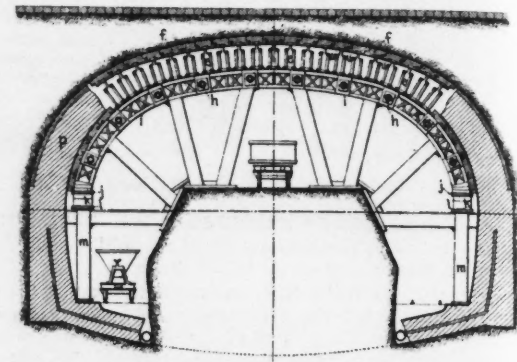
CROSS-SECTION OF TUNNEL SHOWING PLACING OF MASONRY ARCH.
